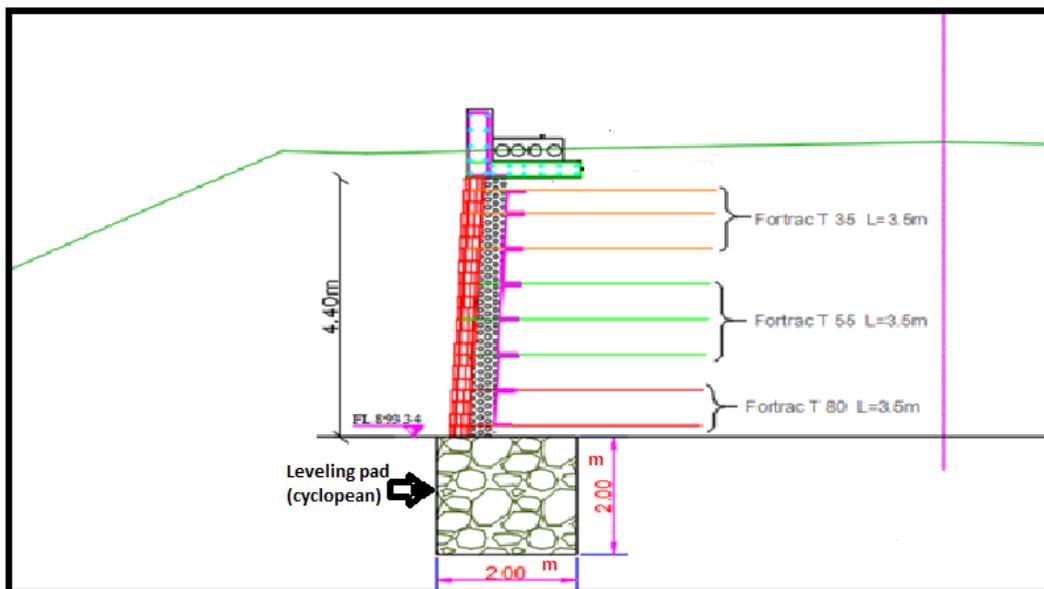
The General design of the proposed geo-synthetic retaining wall (from station 0+540 to station 0+690) using GGU software
